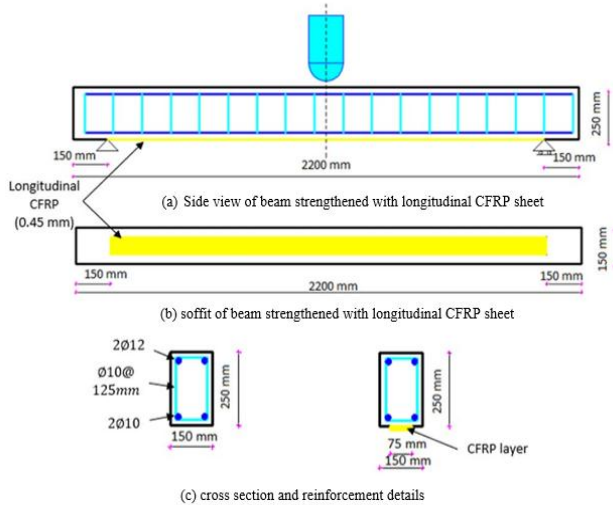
Details of CFRP strengthened RC beam specimens[8].
